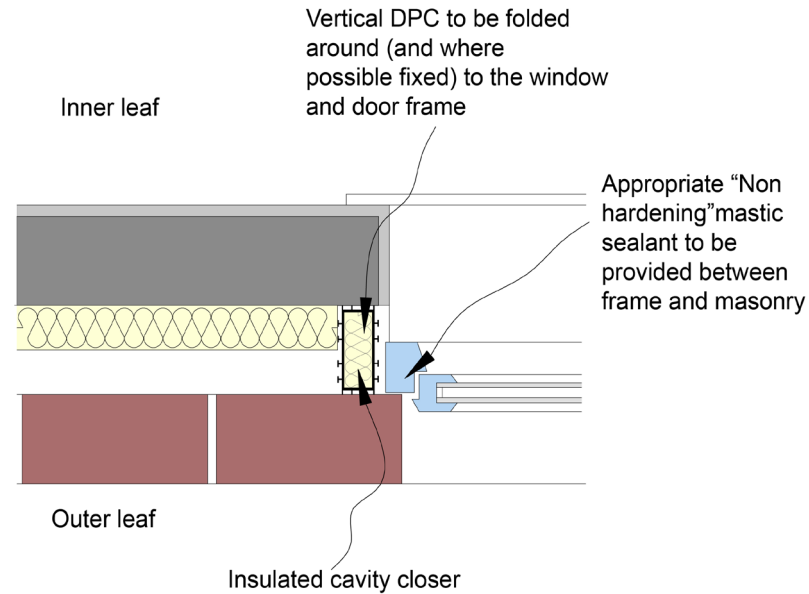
Traditional cavity wall with a checked rebate detail (insulation value of wall construction to meet relevant standards)
